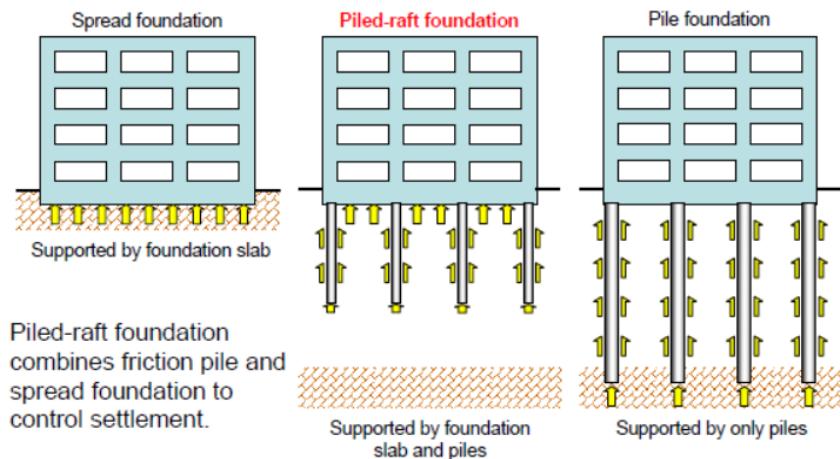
A comparison between the performance of raft foundation, pile foundation, and piled spread foundation
